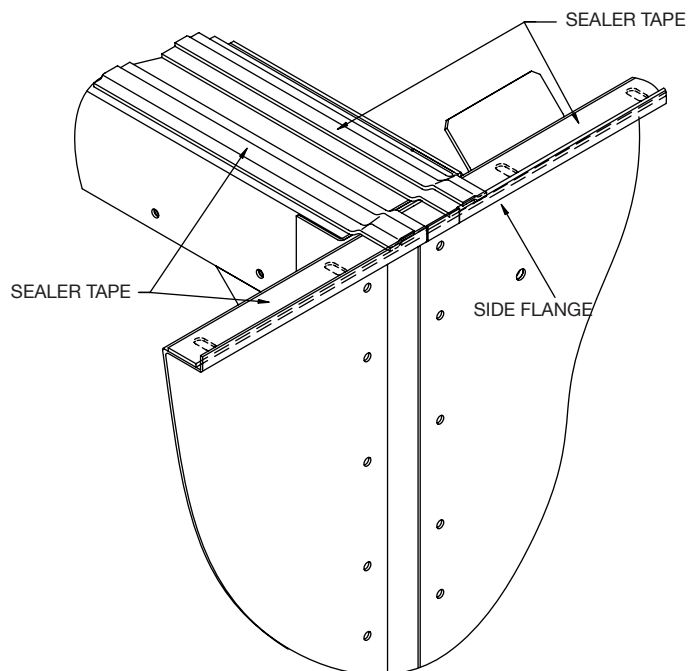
Sealer Detail for Center Joint of Units with two Coil Sections
